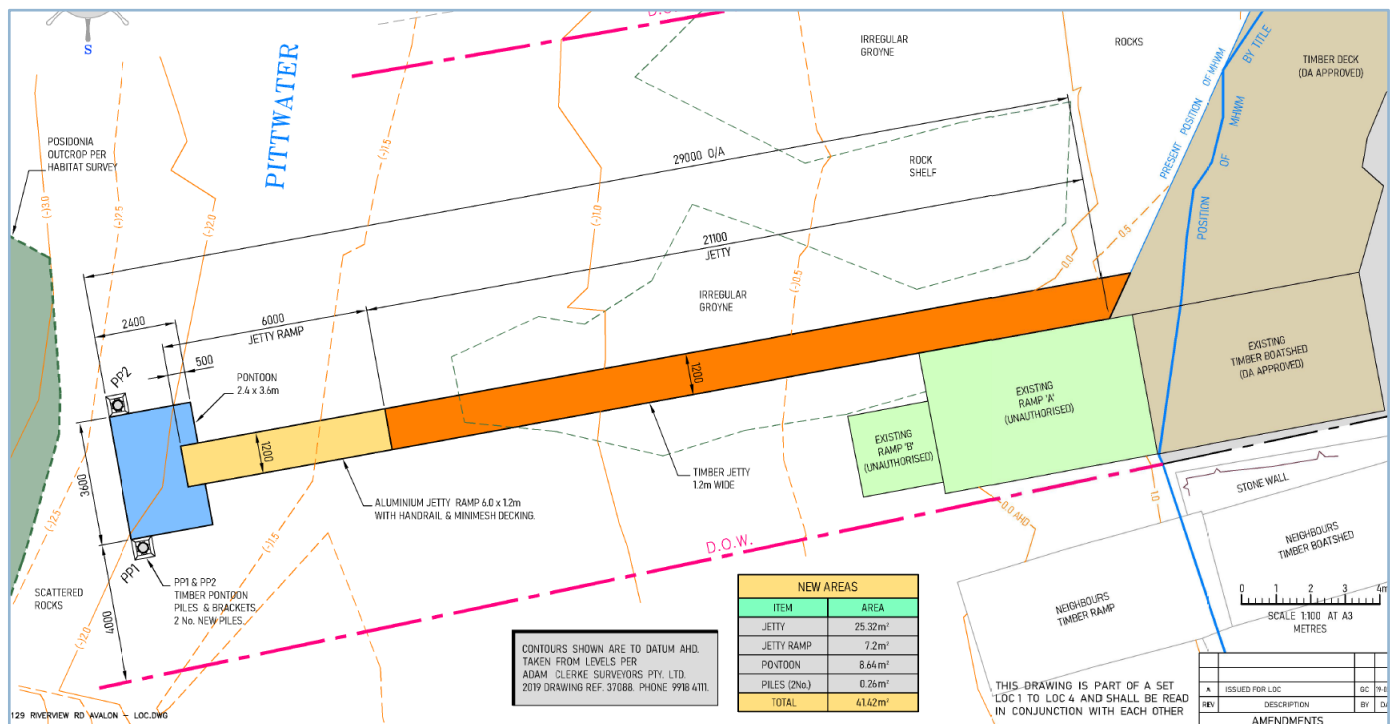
Installation of a new jetty, ramp, pontoon and 2 fender piles.
